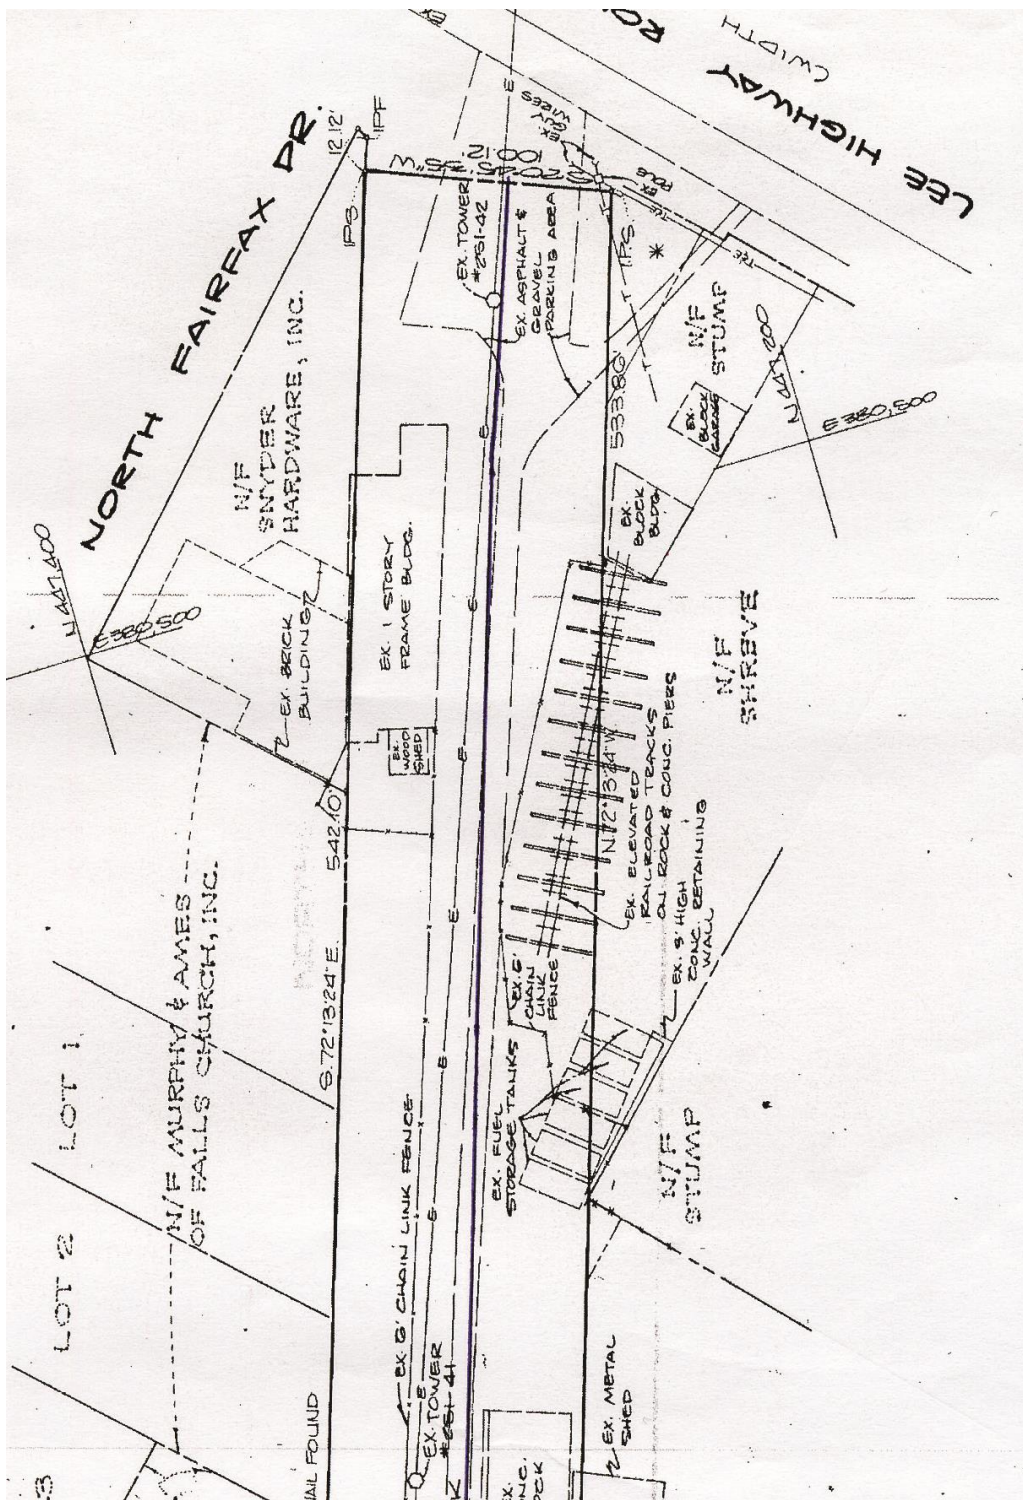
Northern Virginia Regional Park Authority Plat, 1979. The map shows “elevated railroad tracks on rock and concrete piers.”
